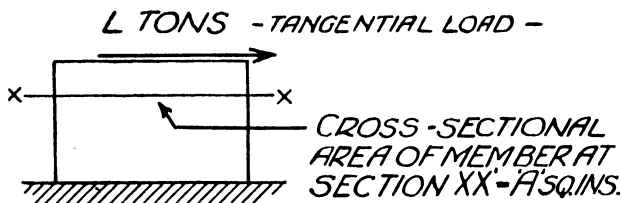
MEMBER SUBJECTED TO SHEAR STRESS.
